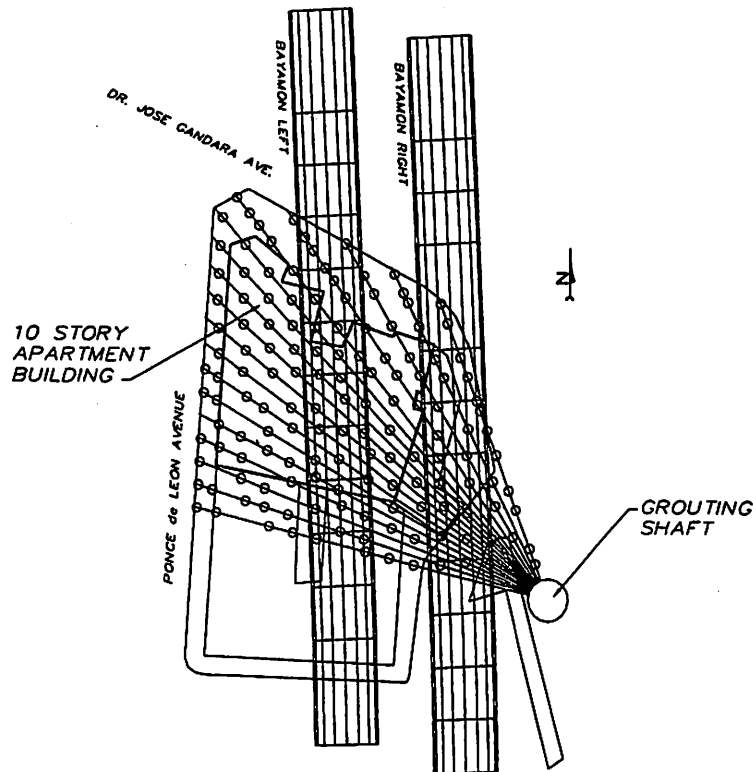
TAM Pipe Arrangement From a Single Shaft, 10-Story Apartment Building Above Twin EPBM Tunnels
